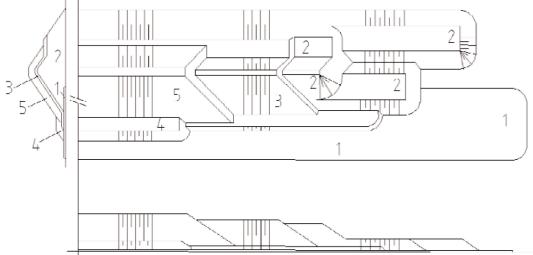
Typical plan view, side view and cross-section of waterborne breakwater construction (CIRIA; CUR; CETMEF, 2007); equipment not shown
